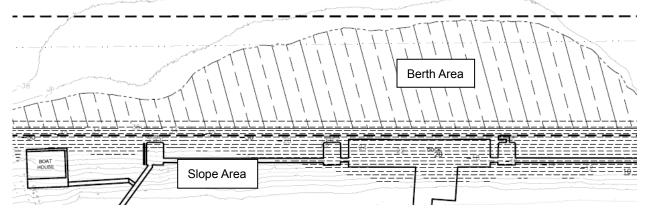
Berth Area and Under-Dock/Adjacent Slope Area to be Dredged
